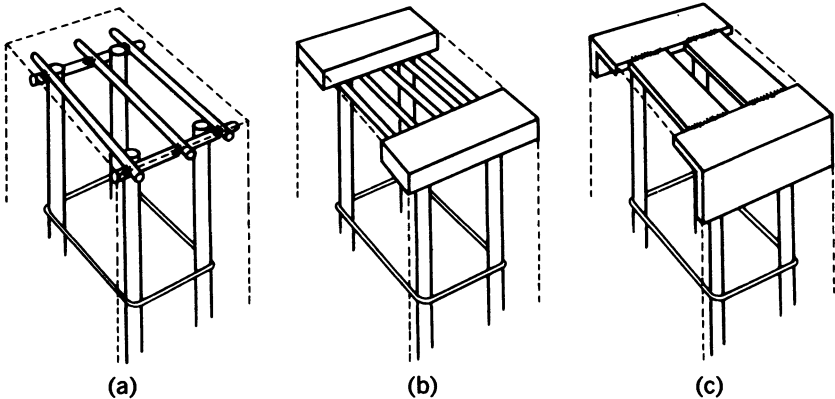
Configurations of welded lateral reinforcement in concrete column heads.
